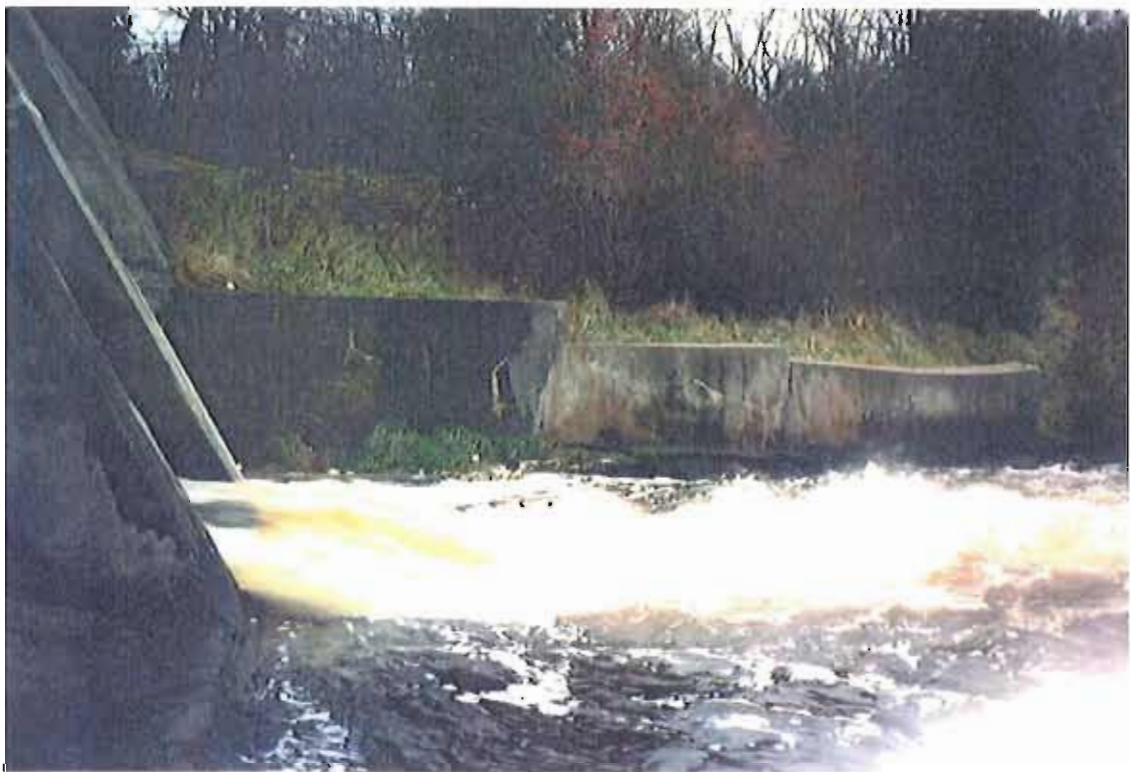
Downstream face of spillway No. 1. The arrows show the locations of core No. 1 in the buttress and core No. 2 in the toe of the spillway. Core No. 8 was drilled vertically into the top of the buttress. Note the intensity of cracking on the spillway face as the result of freeze-thaw and wetting-drying effects.
